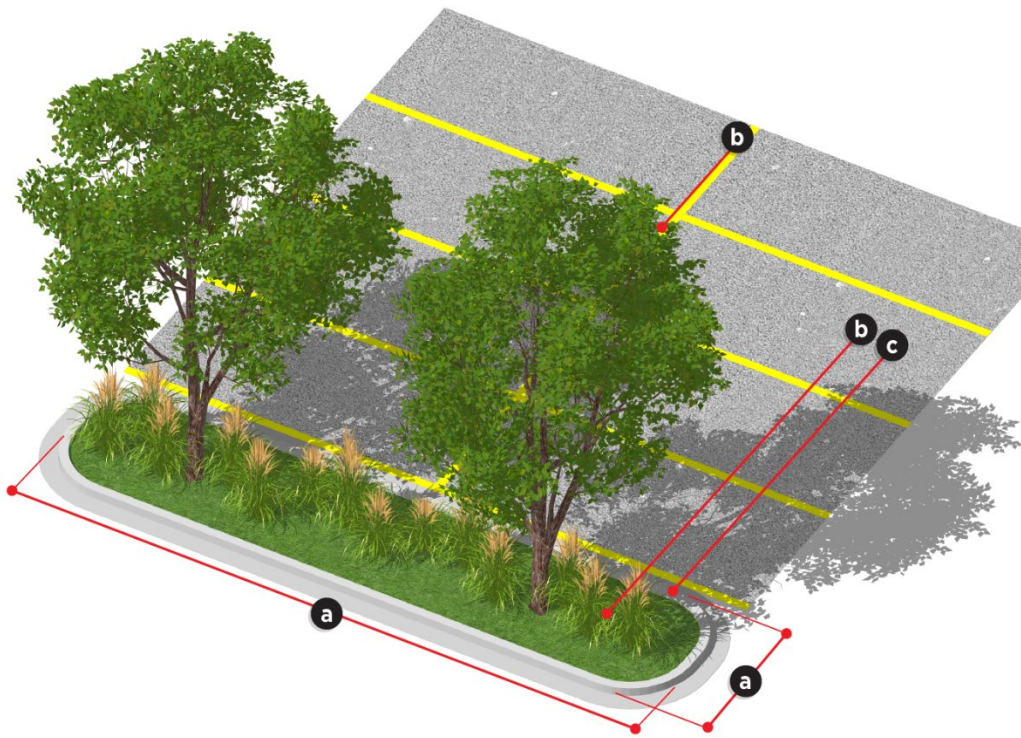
Off-Street Parking Area Interior Landscape Zone in Rear of Primary Building
